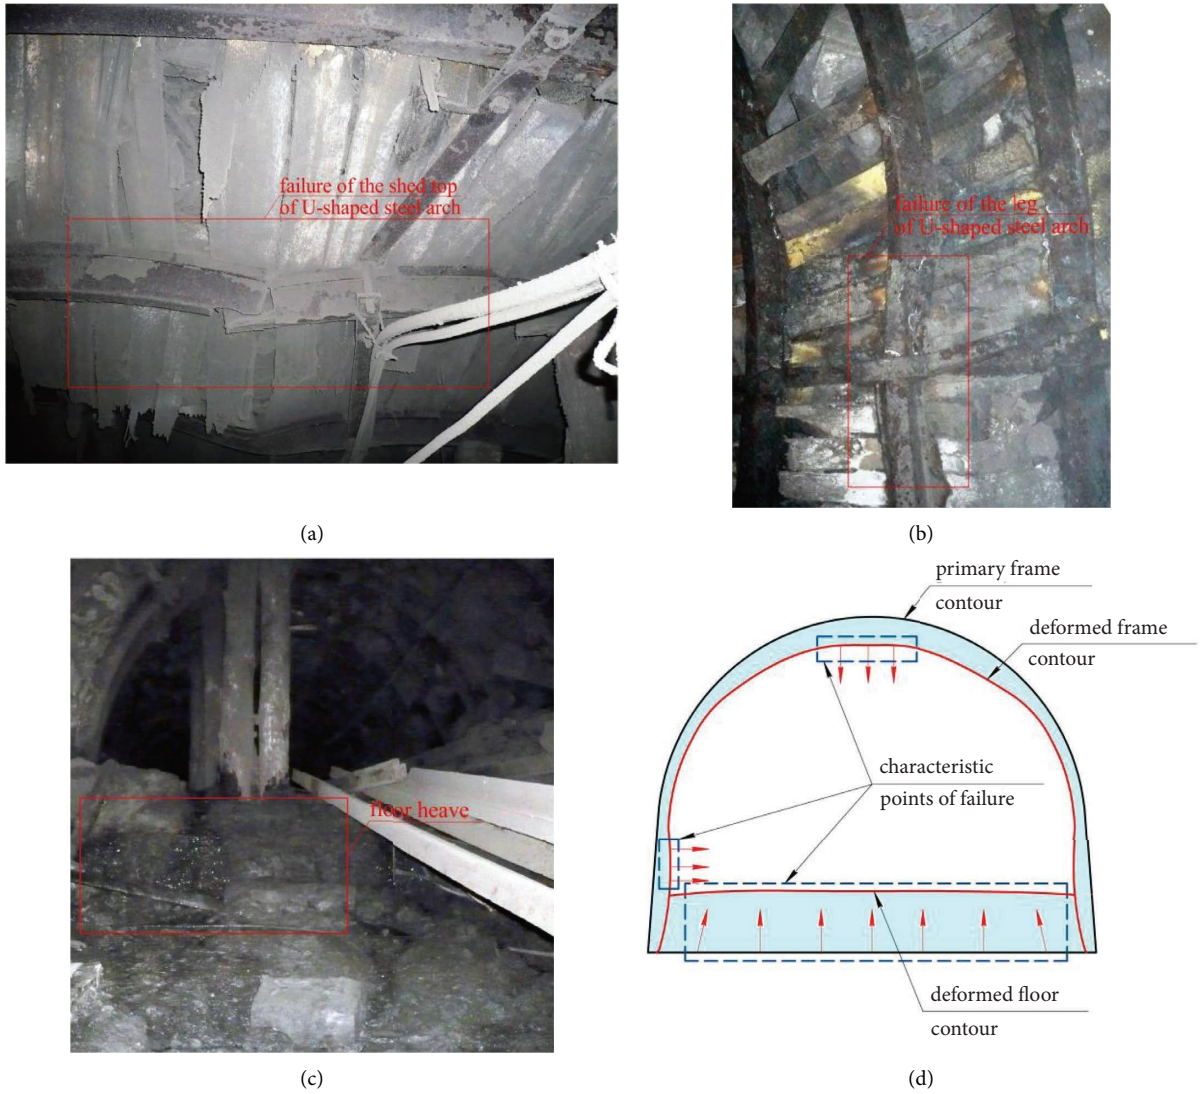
The characteristics of rupture of the roadway: (a) the failure of the shed top of the U-shaped steel arch; (b) the failure of the leg of the U-shaped steel arch; (c) the floor heave; (d) the characteristic failures of the studied roadway.
